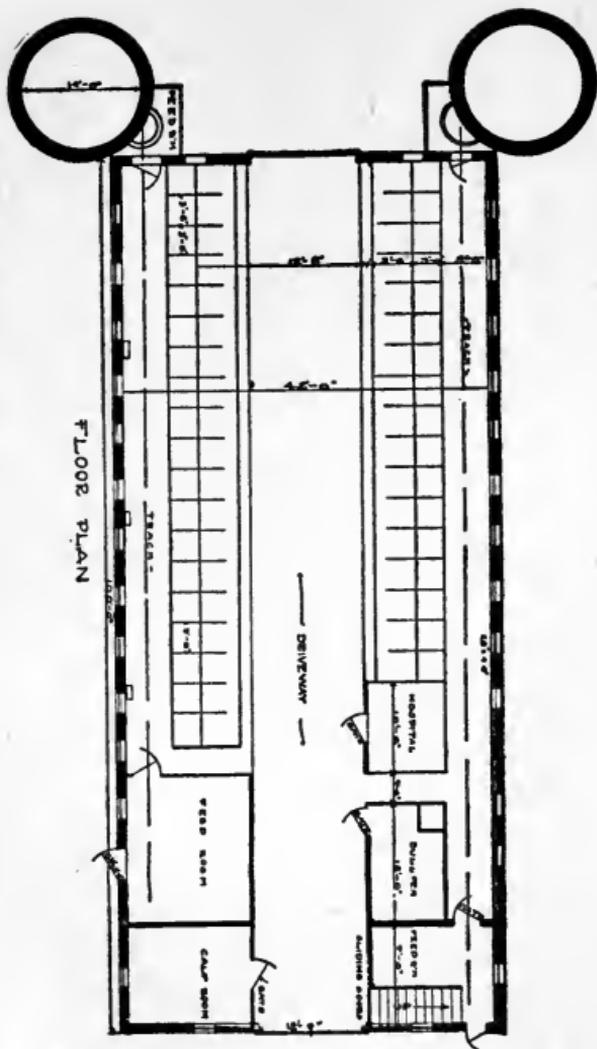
Floor Plan of Dairy Stable with Wide Center Alley. The Silos are Placed at the Corners to Leave Free Passageway Clear Through the Stable to Drive in at One End and Out at the Other End
